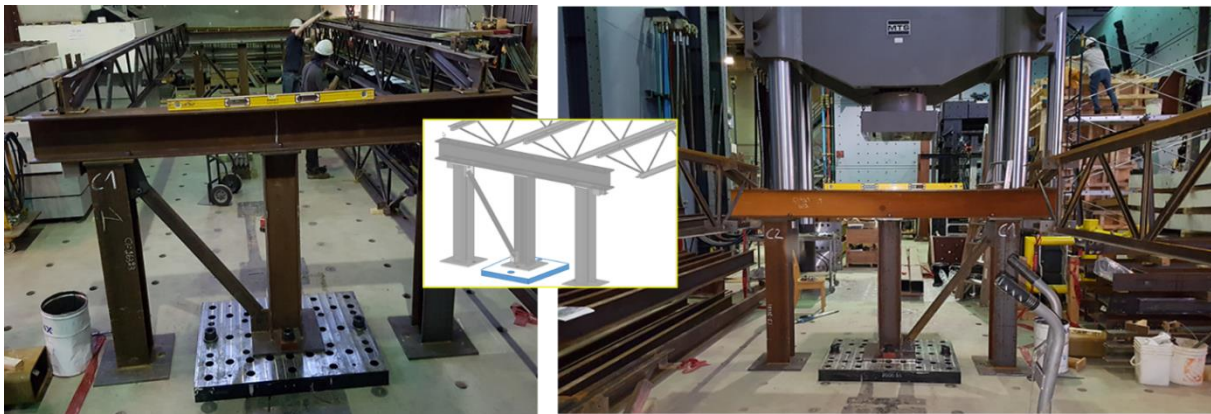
Supporting beam and column system anchored to the laboratory strong floor.
